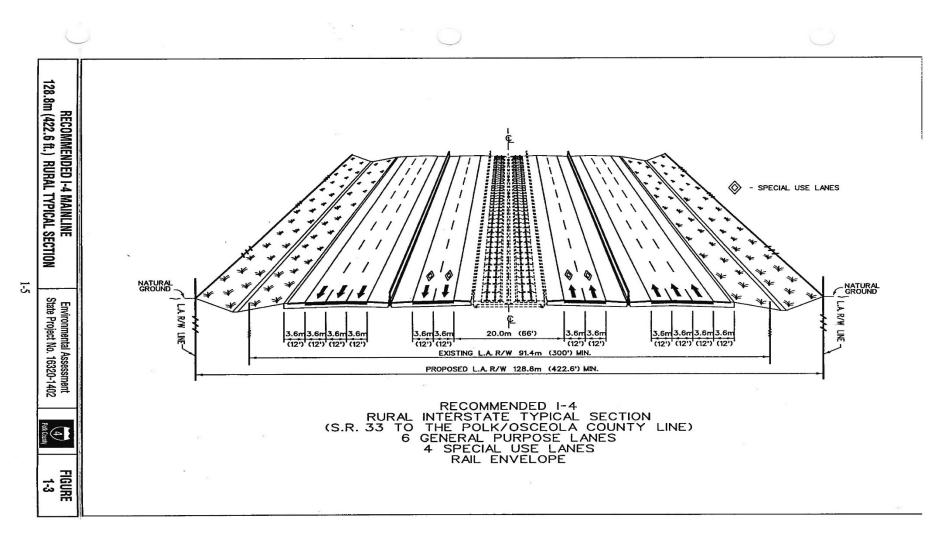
SR 400 (I-4) 1998 EA/FONSI Typical Section
